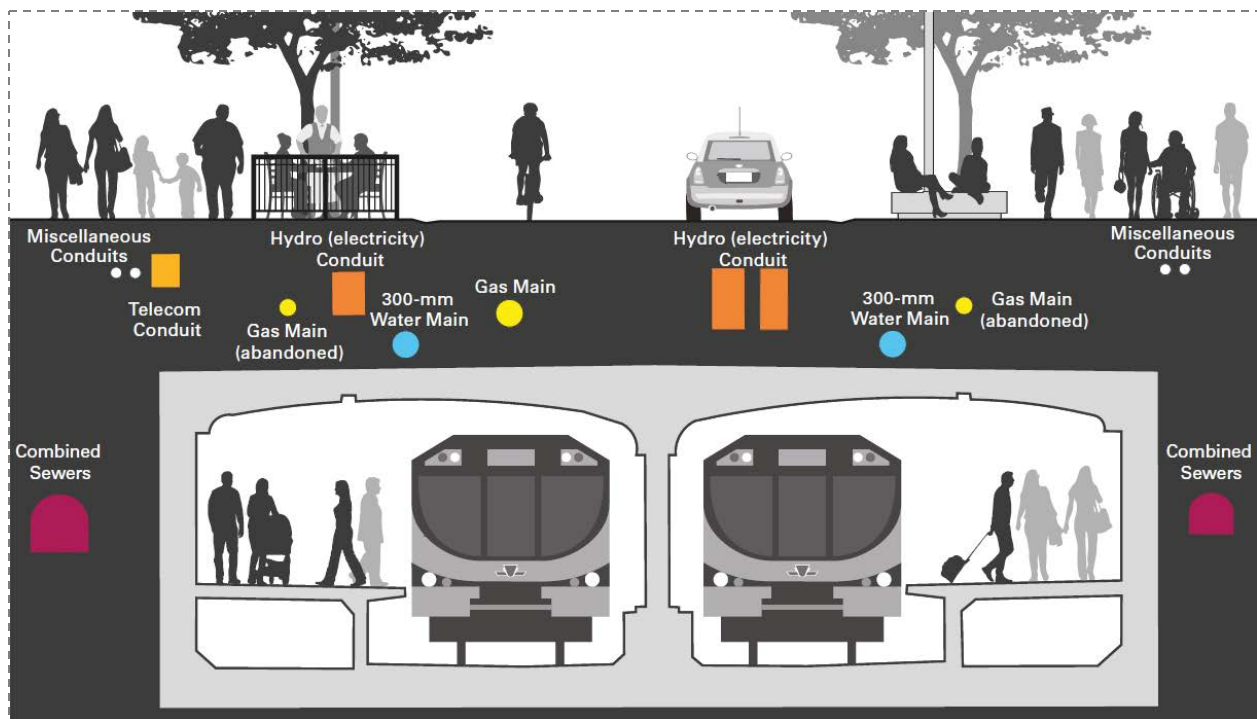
Typical cross section illustrating Recommended Design Concept in relation to existing utilities.
